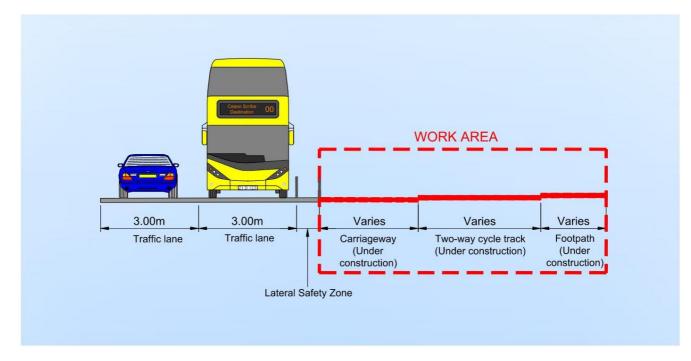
Traffic Management Cross Section, Section 1i – Stage 1
